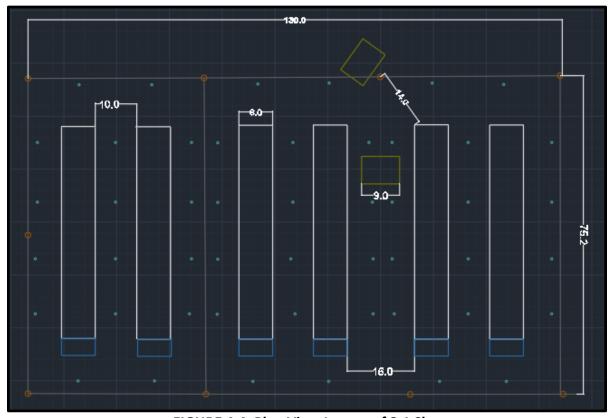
Plan View Layout of 3:1 Slopes
